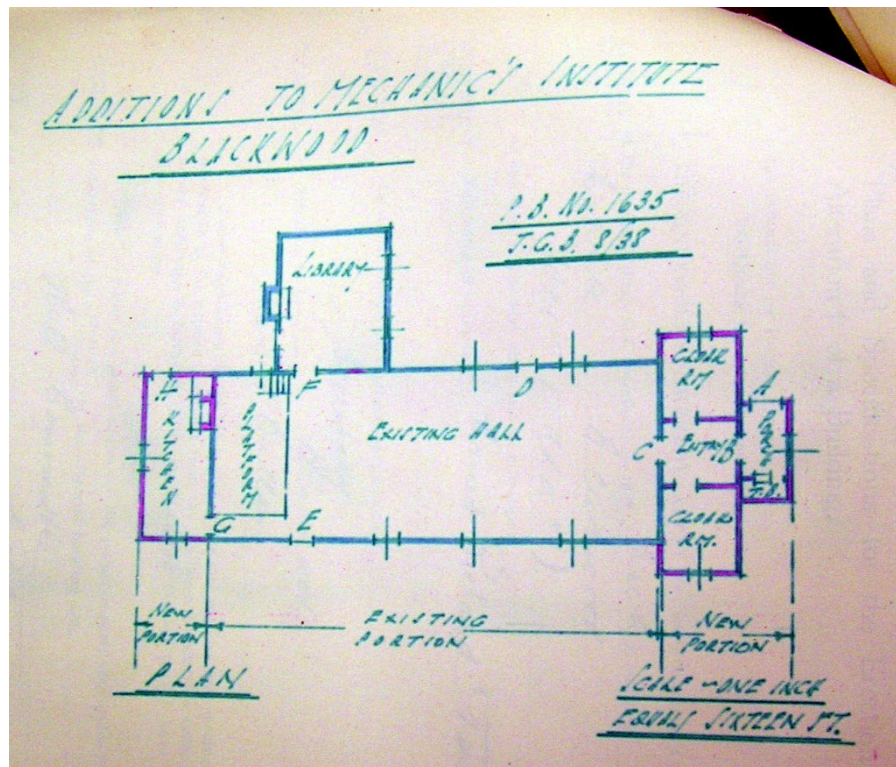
Floor plan of the Blackwood Mechanics' Institute showing proposed additions, n.d. [c.1930s].
